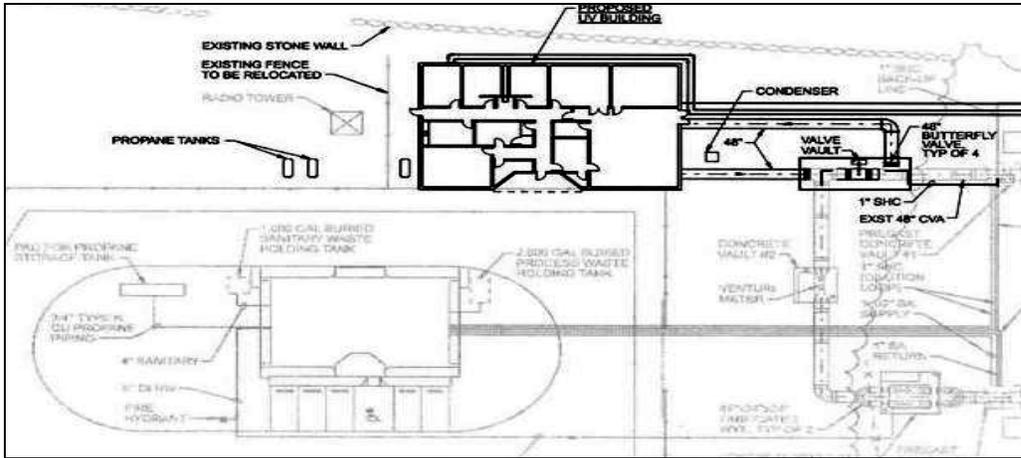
Existing Ware Disinfection Facility and Proposed UV/chlorine/Chloramination Facility
